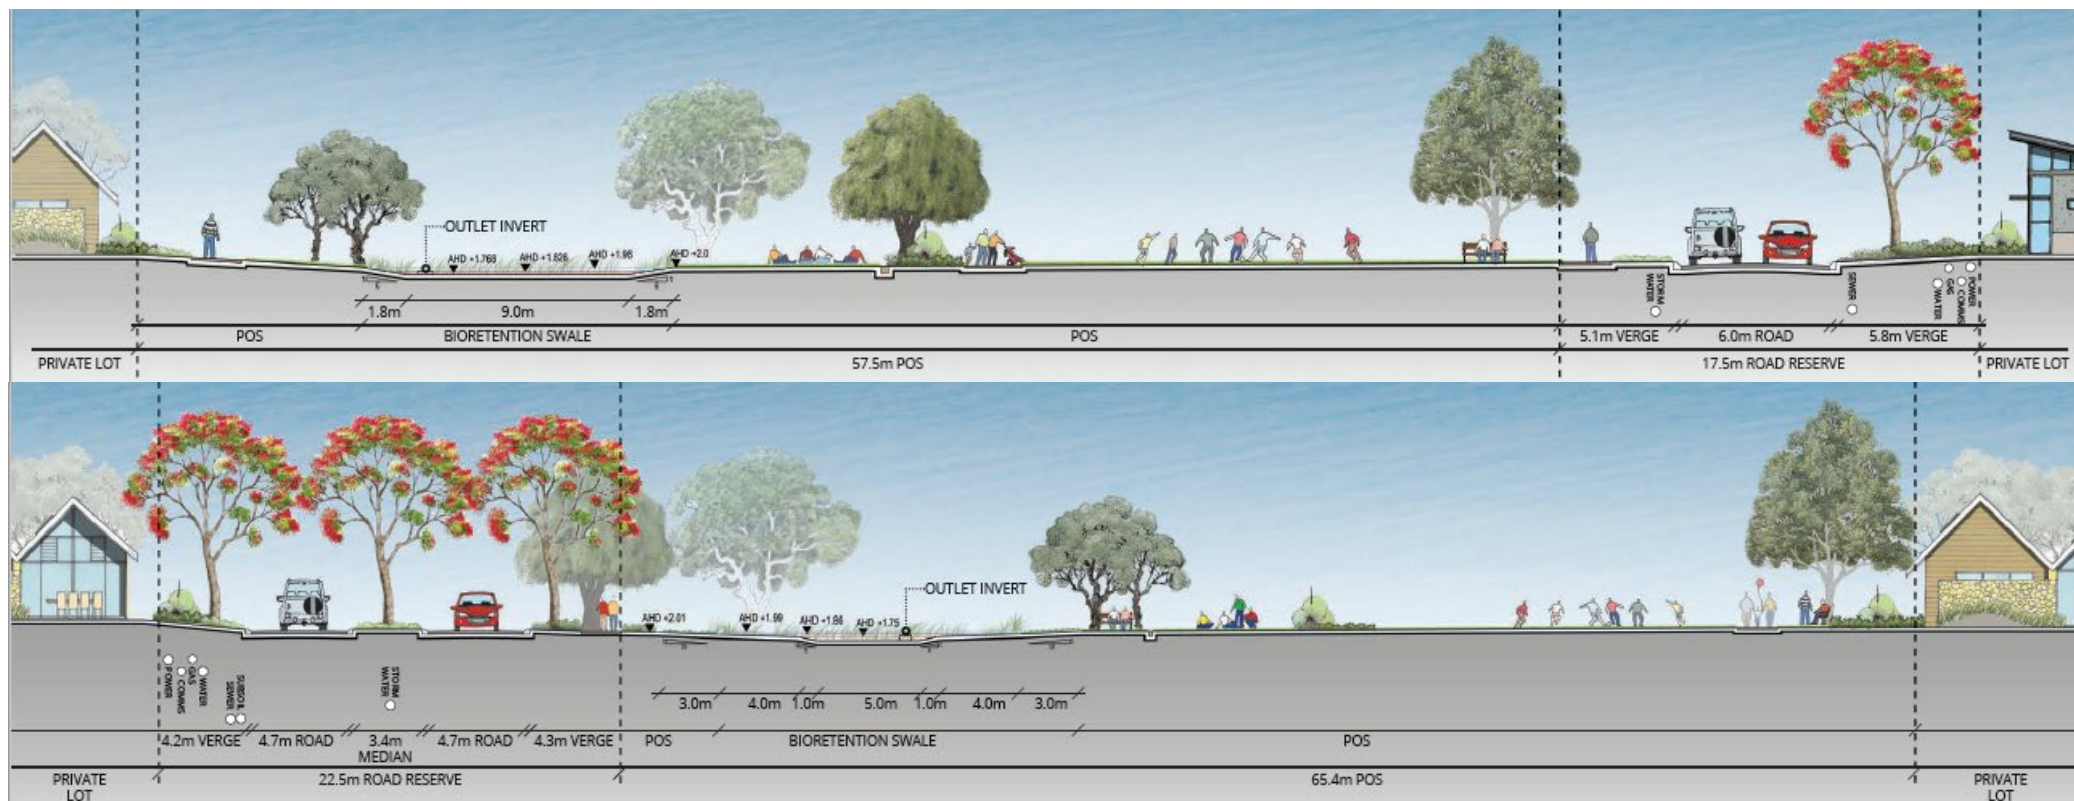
POS Section – 17.5m Road Reserve and Bioretention Swale Section EE (Emerge Associates, 2018)
